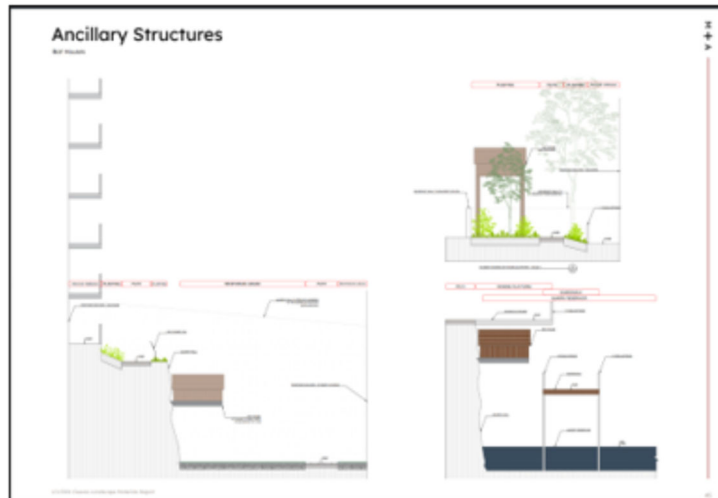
Extract from LCLE001 Landscape Plan showing proposed bat houses
